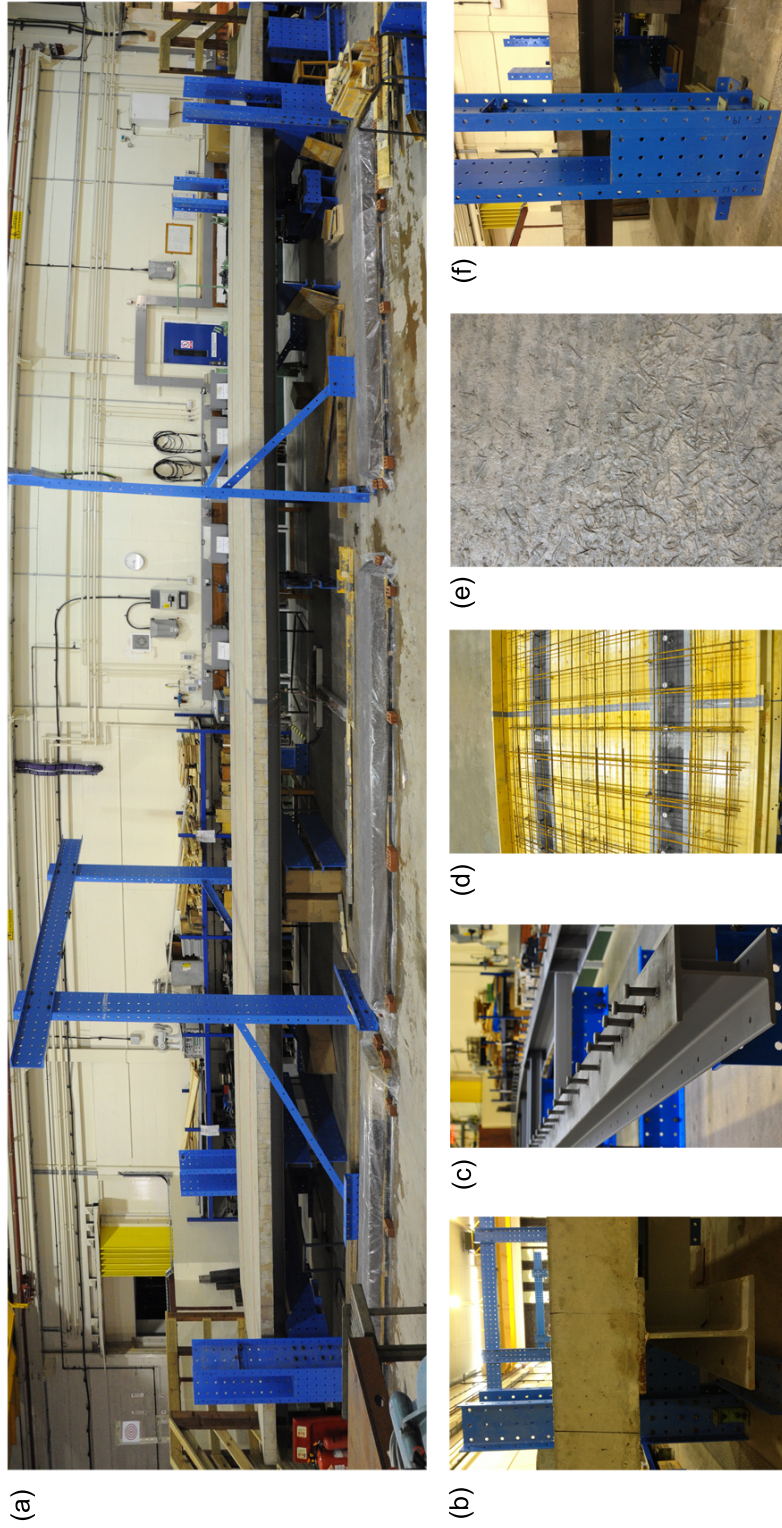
Warwick Bridge: (a) panoramic view (image is distorted), (b) part of composite cross section, (c) studs welded on the top flanges of I-profiled steel beams, (d) formwork and reinforcement mesh for the concrete deck, (e) finished surface of concrete mixed with polypropylene fibres and (f) one support.
